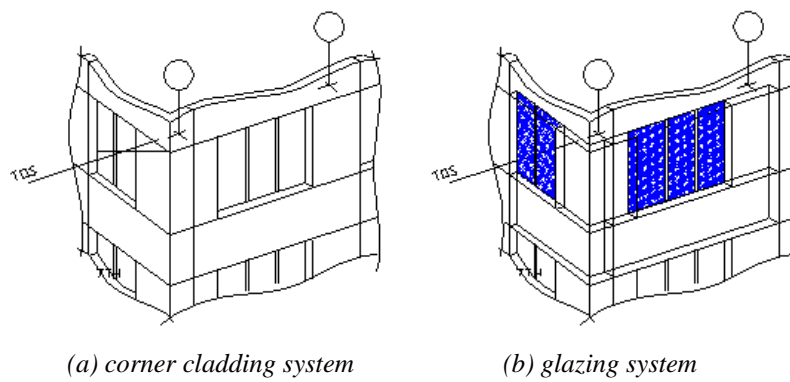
Corner cladding system (McMullin and Nguyen, 2008)
